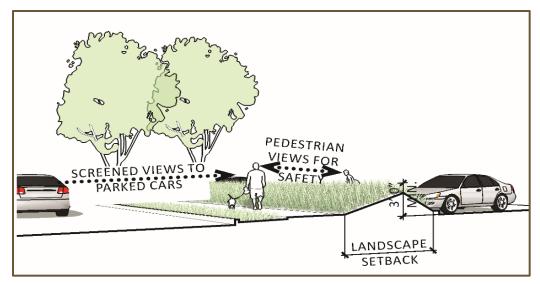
Typical Landscape Condition to Screen Street Views to Parking
